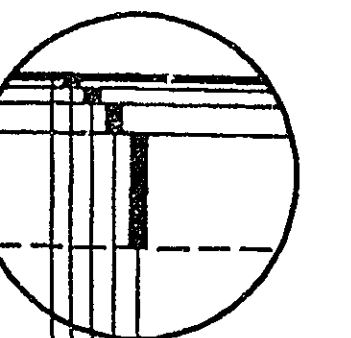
DETAIL B-PROPOSED PAVEMENT THICKNESSES
